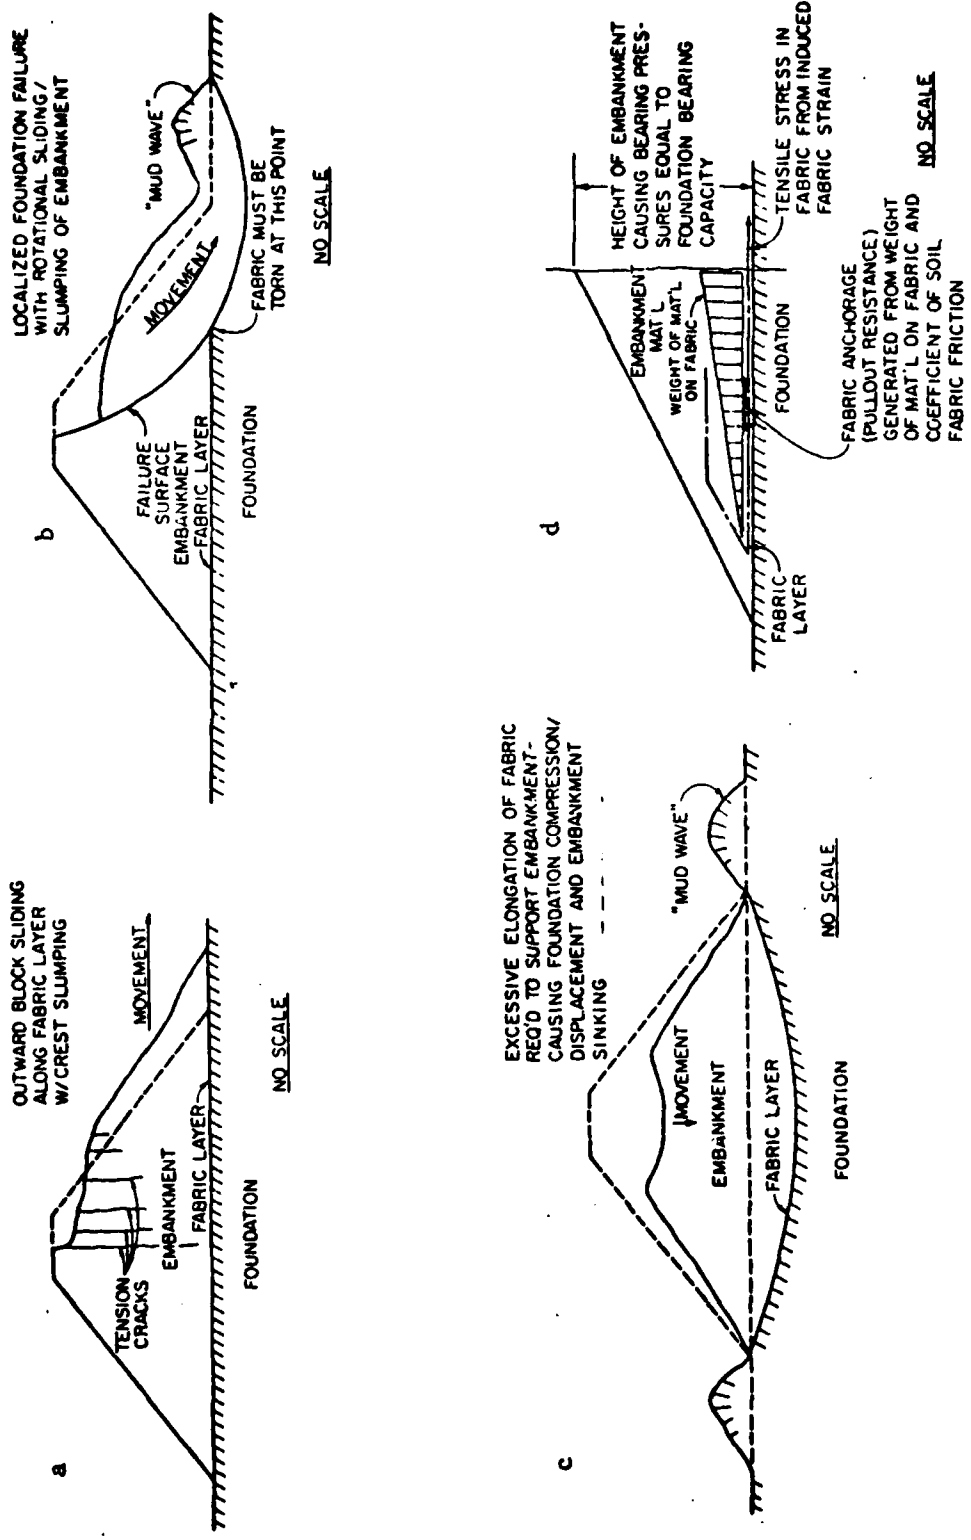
Potential failure modes for a fabric-reinforced embankment on soft foundation (after Ref 2).
